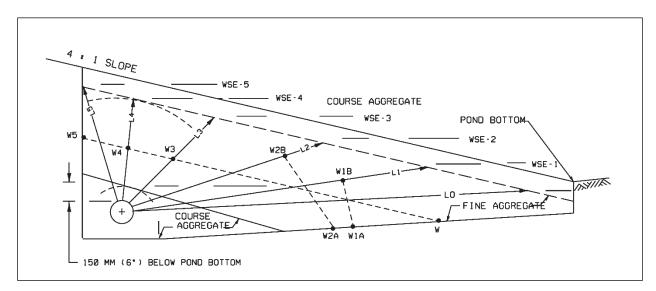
Side Bank Underdrain (Shown 6" Below Upper Limit)
